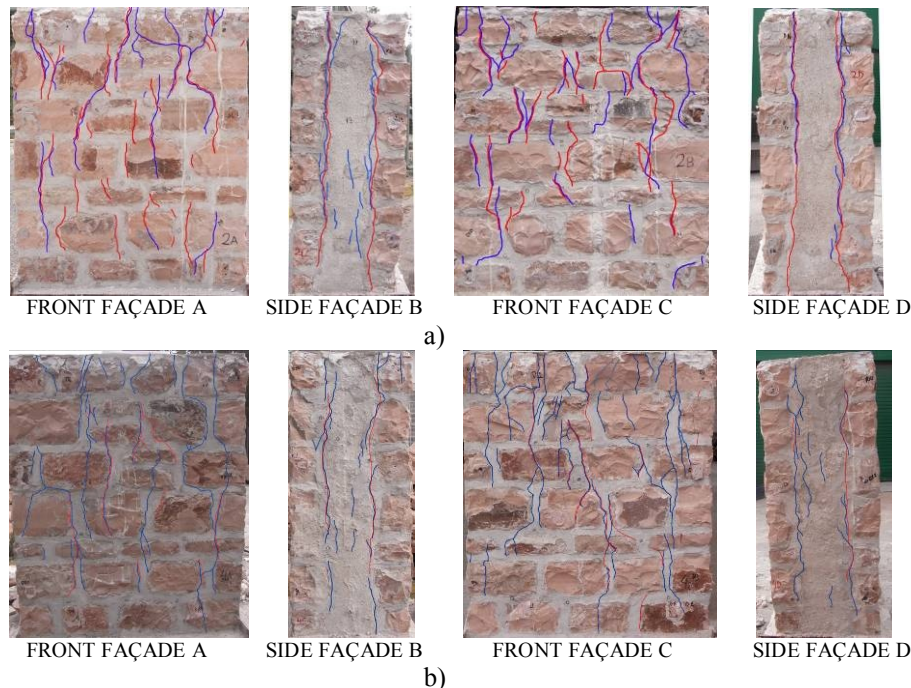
Failure mode in compression before (red line) and after (blue line) grouting of: a) wallette 2, b) wallette 4
